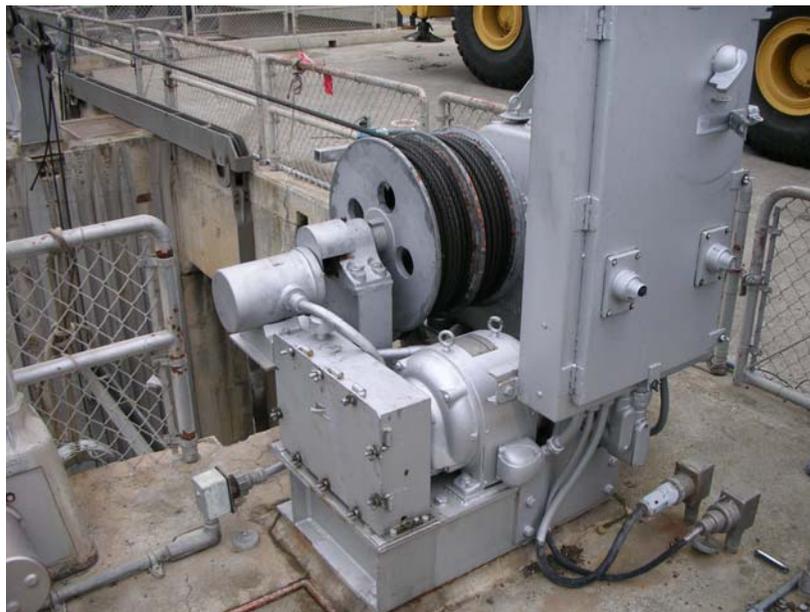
Hoists for raising and lowering telescopic gate at south fish entrance
